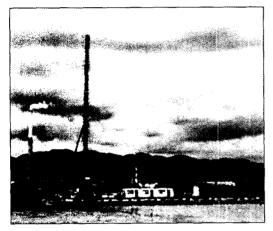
Drain Installation Machine Rigging on a Floating Pontoon(PDF Pontoon)
